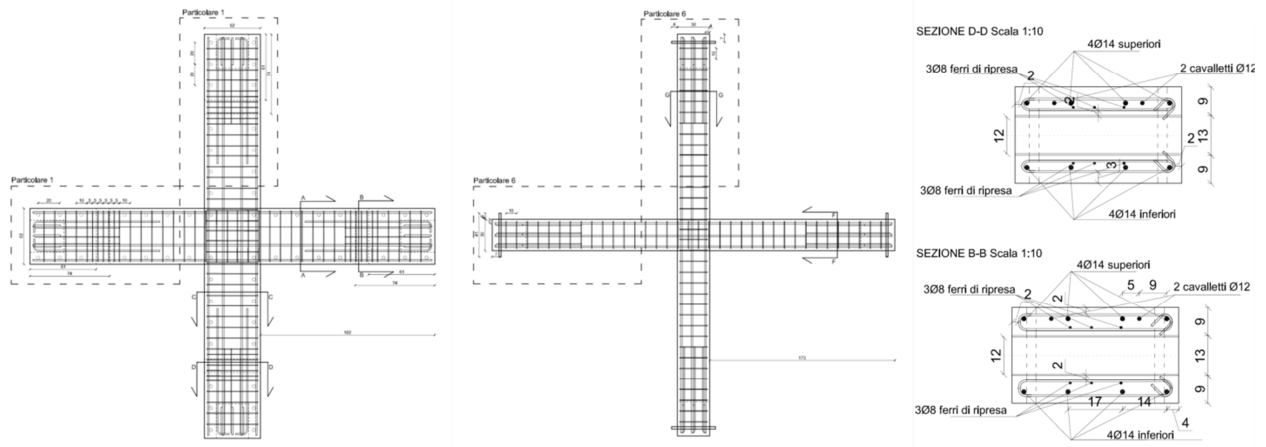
From left to right: base structural plan, top beams structural plan, sections with lifting points. These patterns were common of both the structural units
